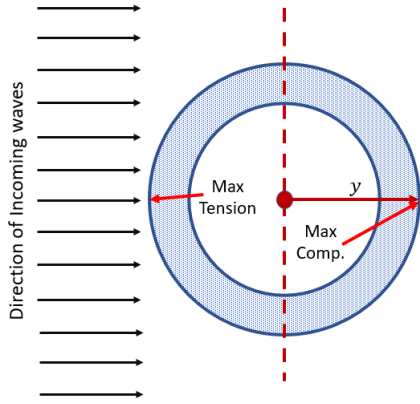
SIMPLIFIED VIEW OF A CROSS SECTION OF THE MONOPILE FOUNDATION, TAKEN AT ITS BASE.
